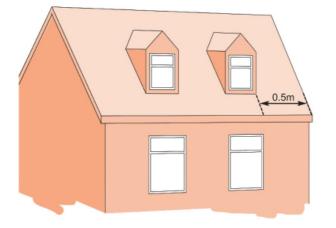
Dormer windows should be in line with the existing windows and be of a similar style. The roof design of the dormer should match or complement the existing roof of the property.
